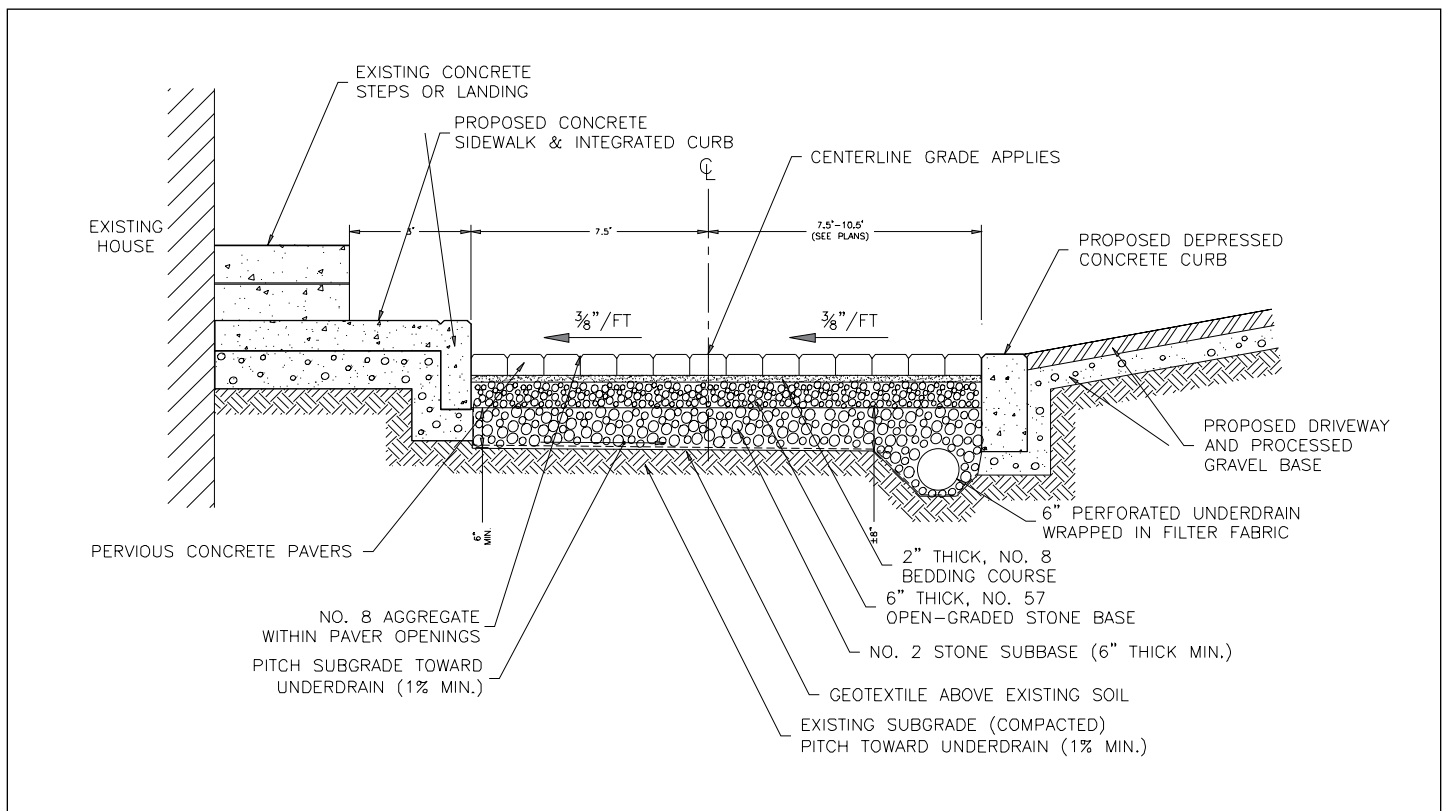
PICP cross section for Upper High Street in Sprague, CT
